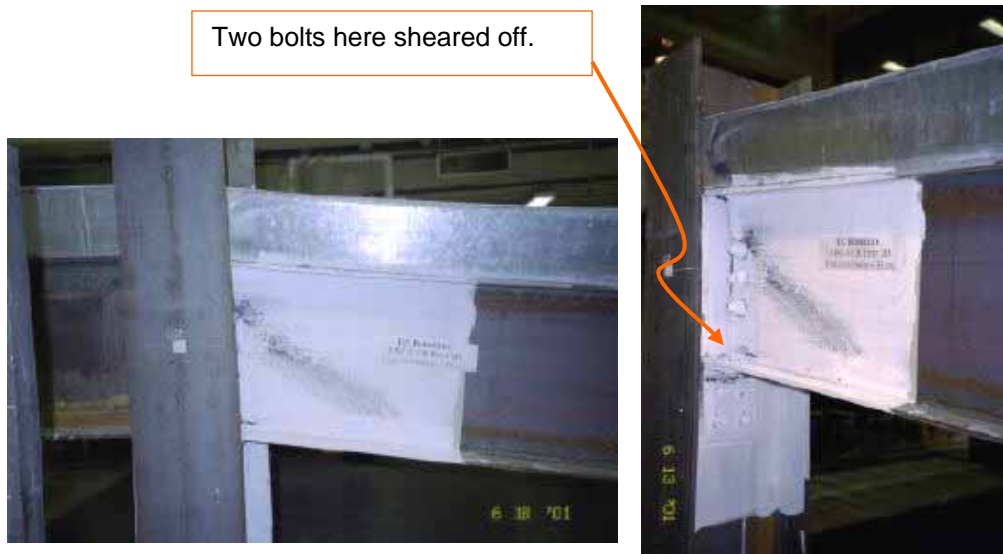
Failure of Bolts Connecting the Beam Bottom Flange to the Seat Angle
